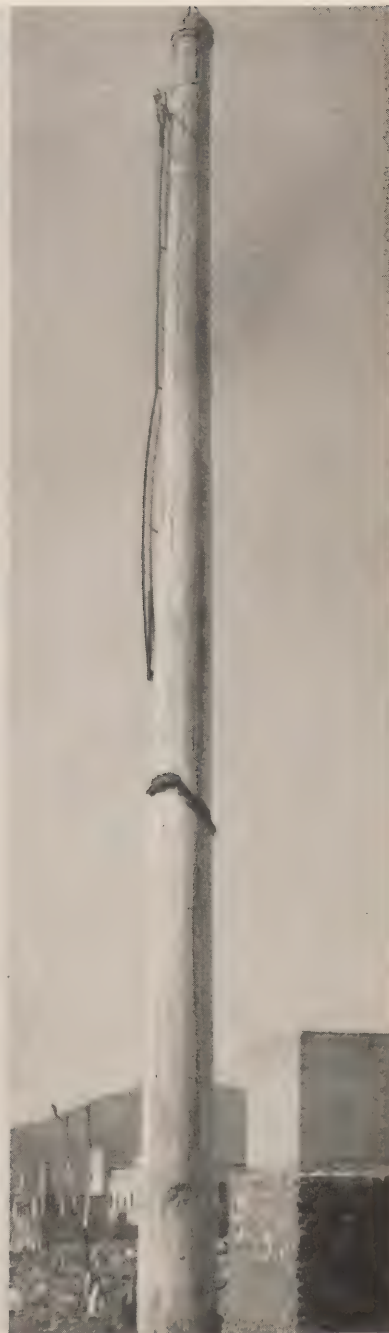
XIV. Stack 48. General view of stack shown on Photo 7.
